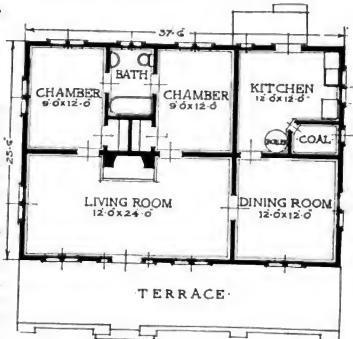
FLOOR PLAN OF CONCRETE BUNGALOW.
